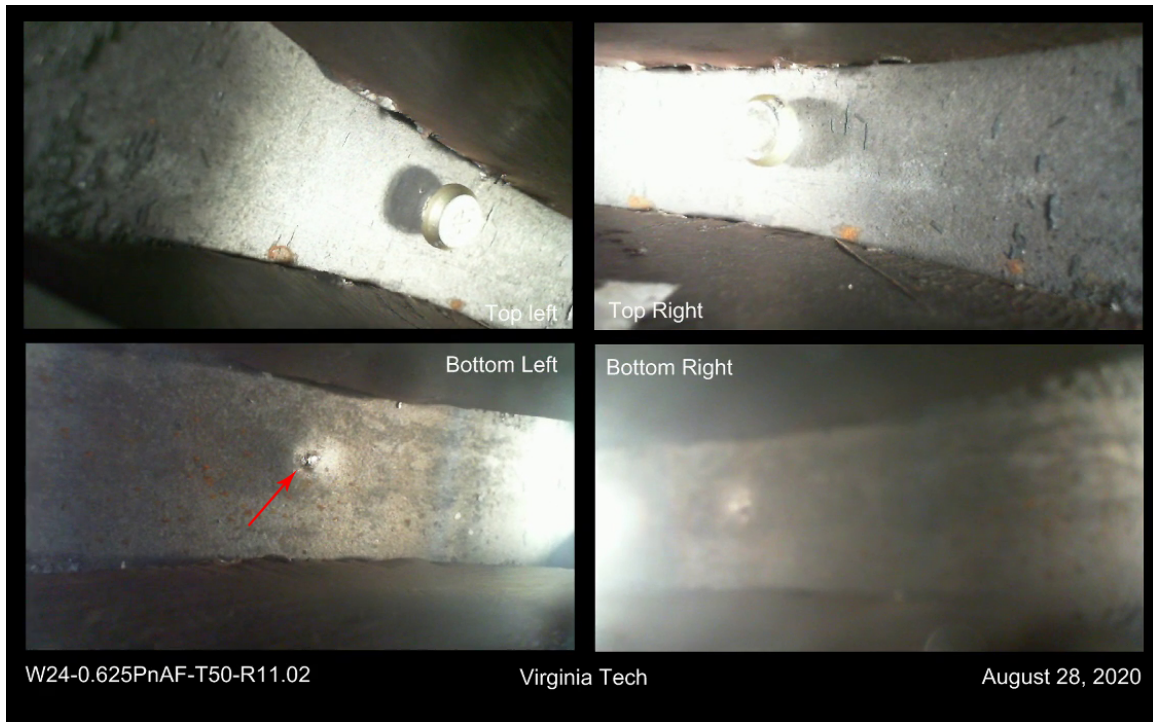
Fracture initiation of W24-0.625PnAF-T50-R11.01.
